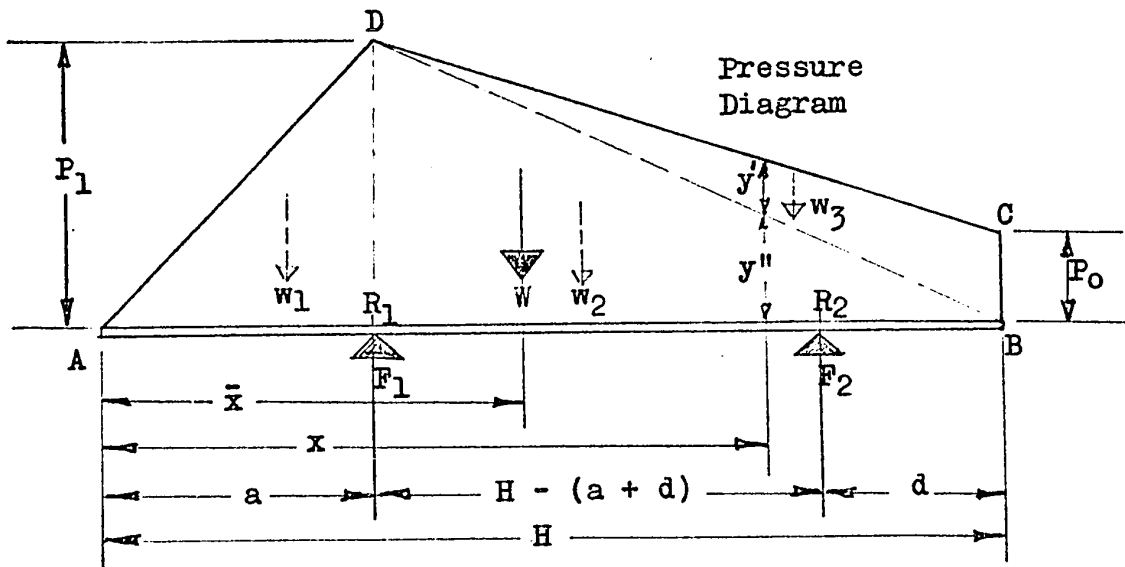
Equivalent beam loaded with diagram of lateral pressure from Railway Loading.
